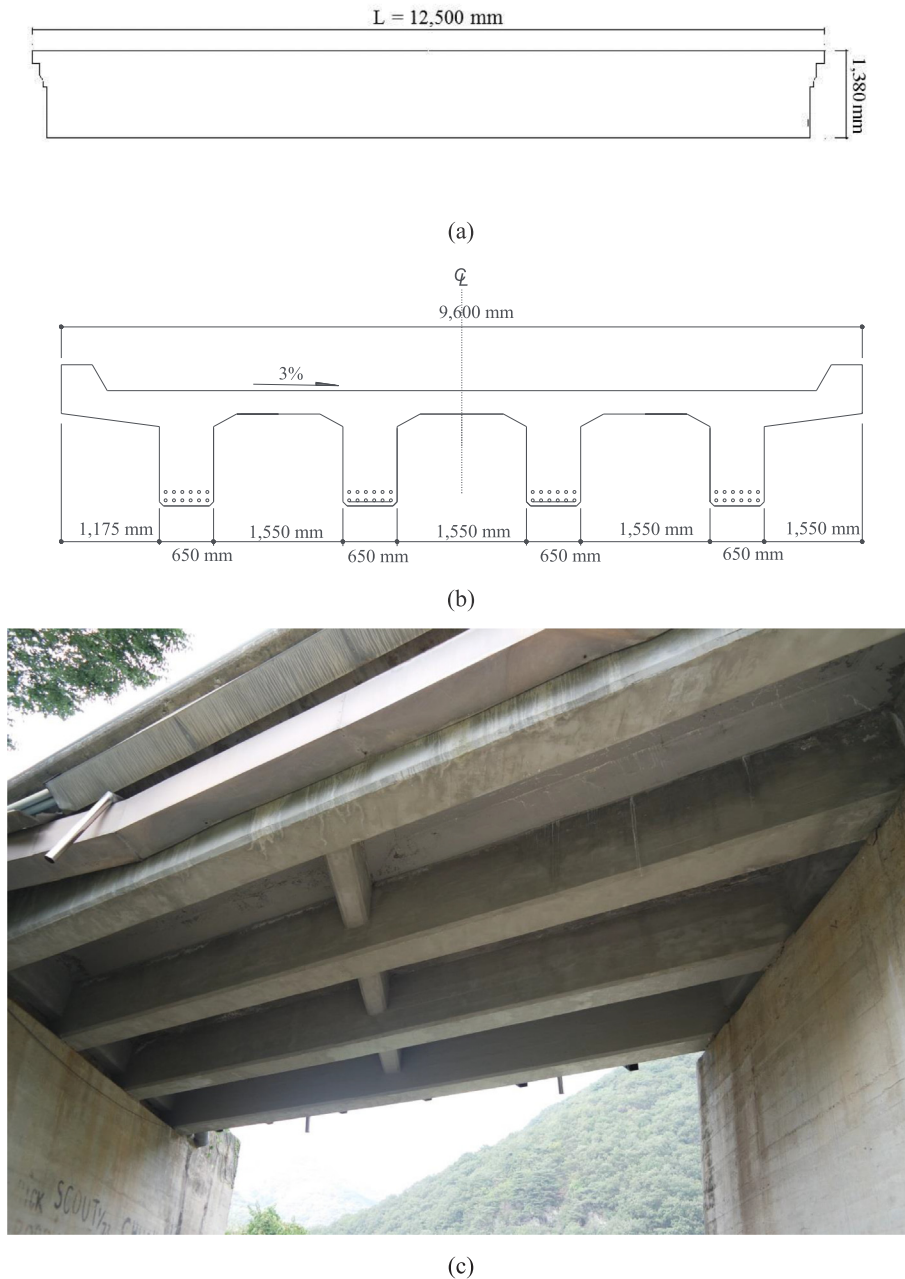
Details of the target bridge: (a) front view, (b) cross-sectional view, and (c) view of girders and abutment.
